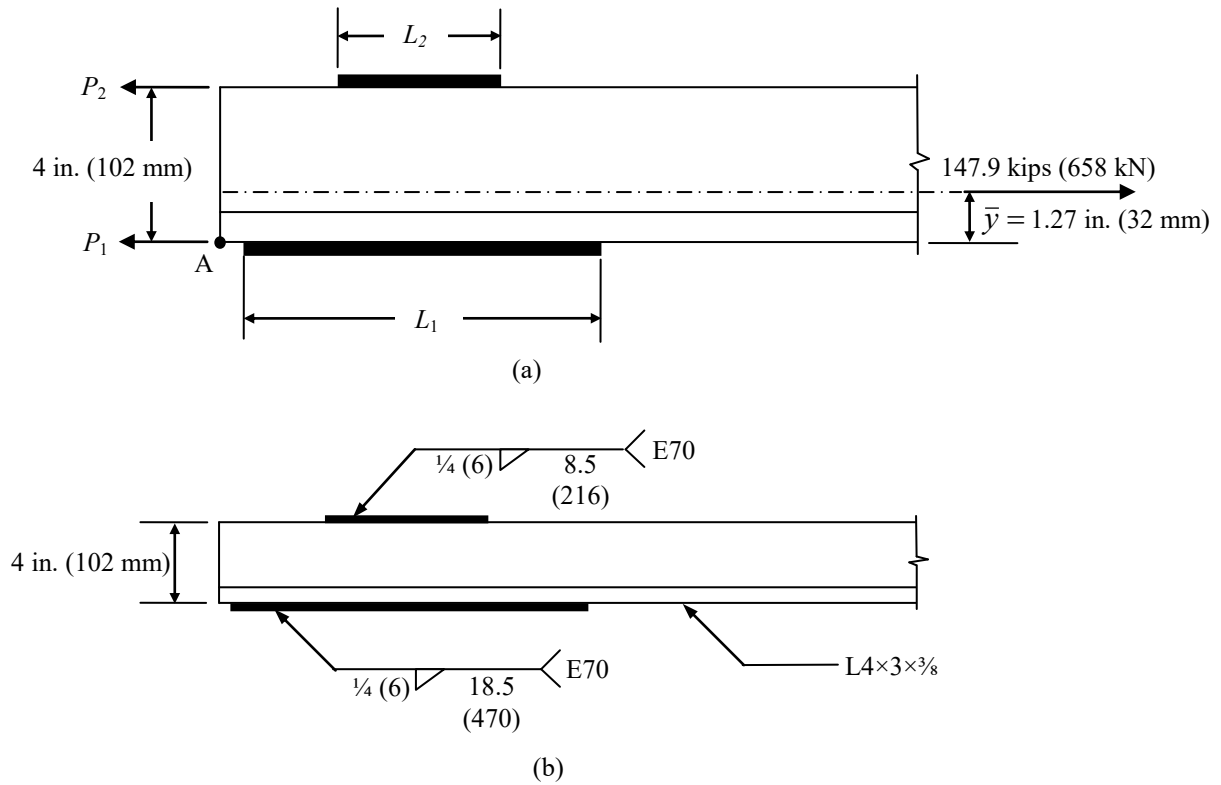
Unequal-Length Longitudinal Fillet Weld Connection for the $L4 \times 3 \times \frac{3}{8}$ Tension Member
